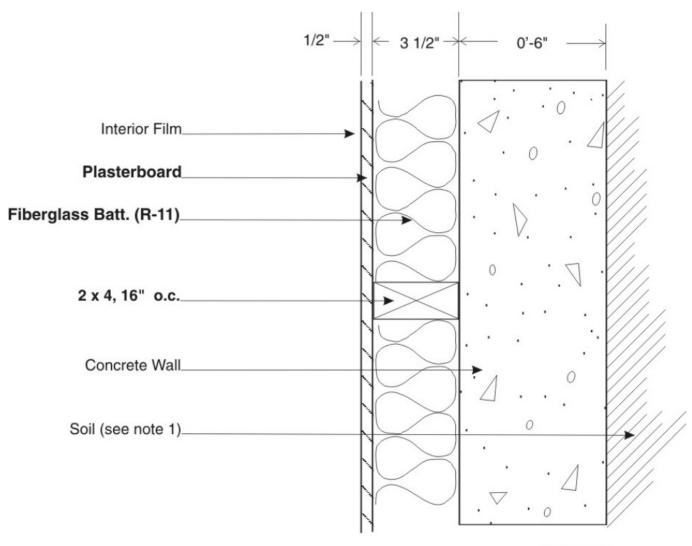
Case L324A Insulated Basement Wall Section (ANSI/ASHRAE 2011, Figure 7-25)
